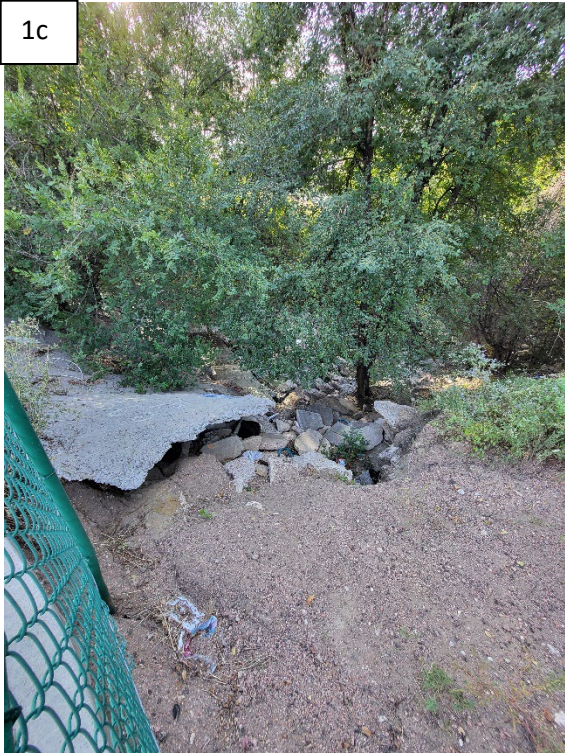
, d, e and 1f. Accumulations of solid waste and section of concrete slab that have entered Spring Creek
